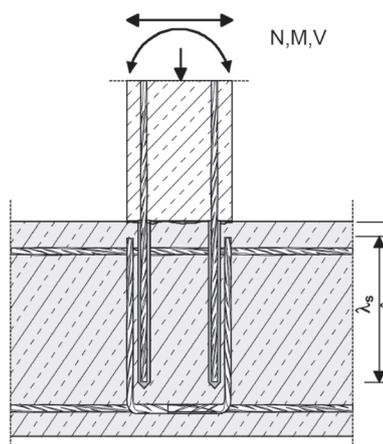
Bond superimposed to a foundation of a column or a wall where the rebars is subjected to tensile force.
